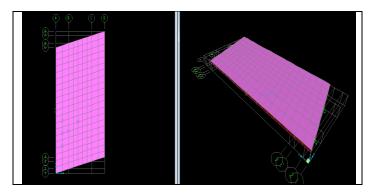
3D View of RC box girder bridge with 15 degree skew angle
